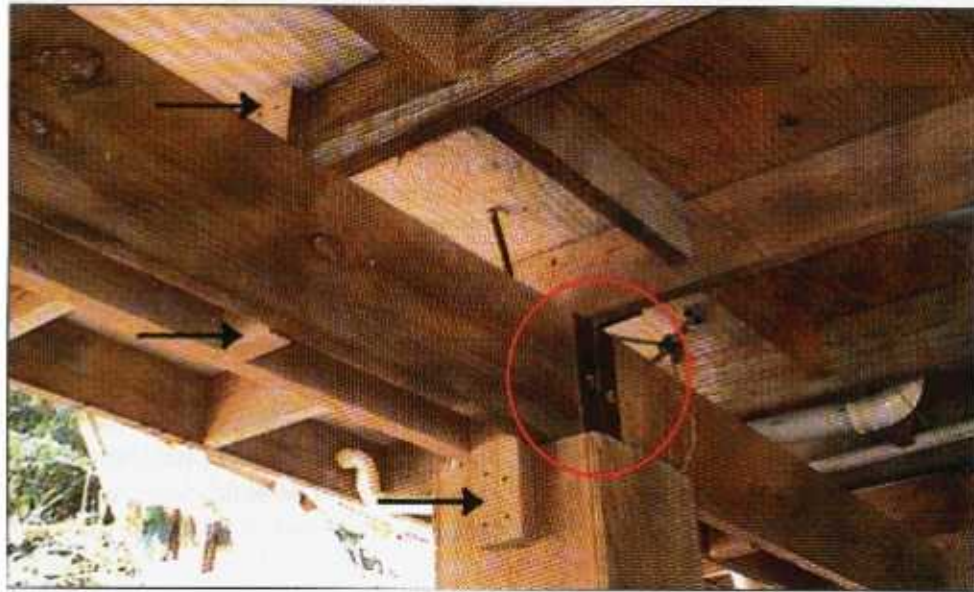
Example of an engineered connection between the floor beam and a concrete column (concrete column is enclosed in plywood). Vertical members (identified by arrows) provide continuous load path from floor joist to floor beams. Floor beams are connected to concrete columns with metal straps (circled). This house was located on the island of Culebra.
